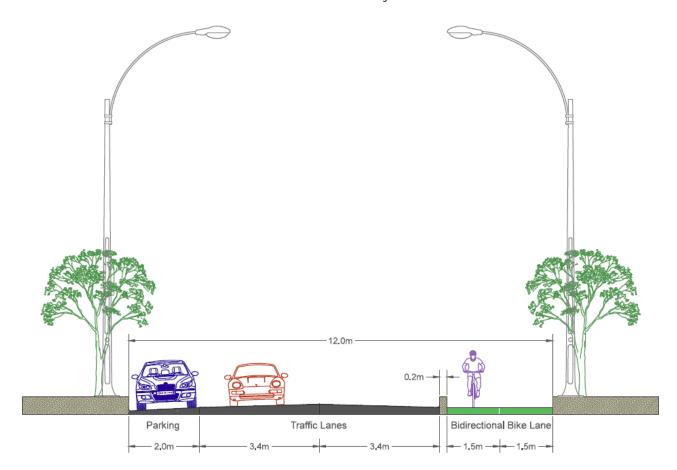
Proposed bidirectional cycleway on Gauthorpe Street, looking west.
